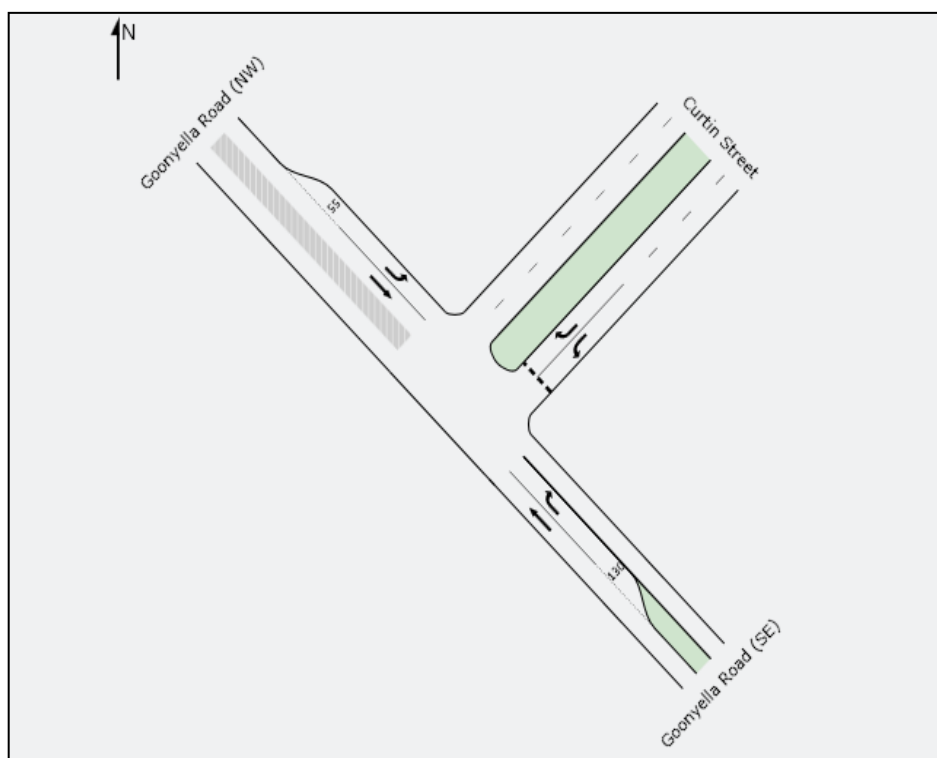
Existing Intersection Layout – Curtin Street / Goonyella Road
